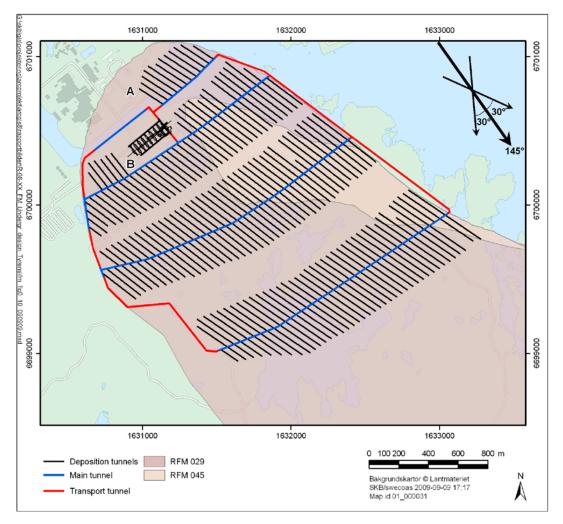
Deposition tunnels oriented sub-parallel to the maximum horizontal stress, shown in the upper right corner. Section at 470 m depth (RHB 70).
